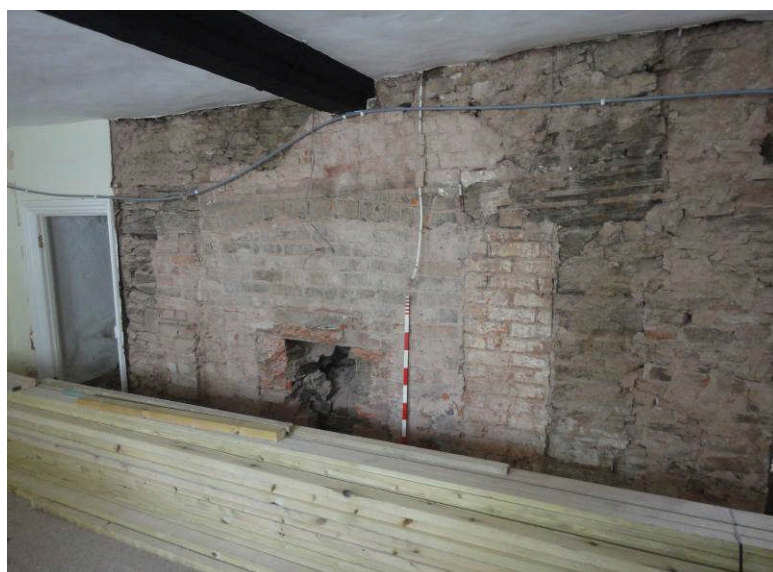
The fireplace in the sitting room, looking NE; scale bar 1m
